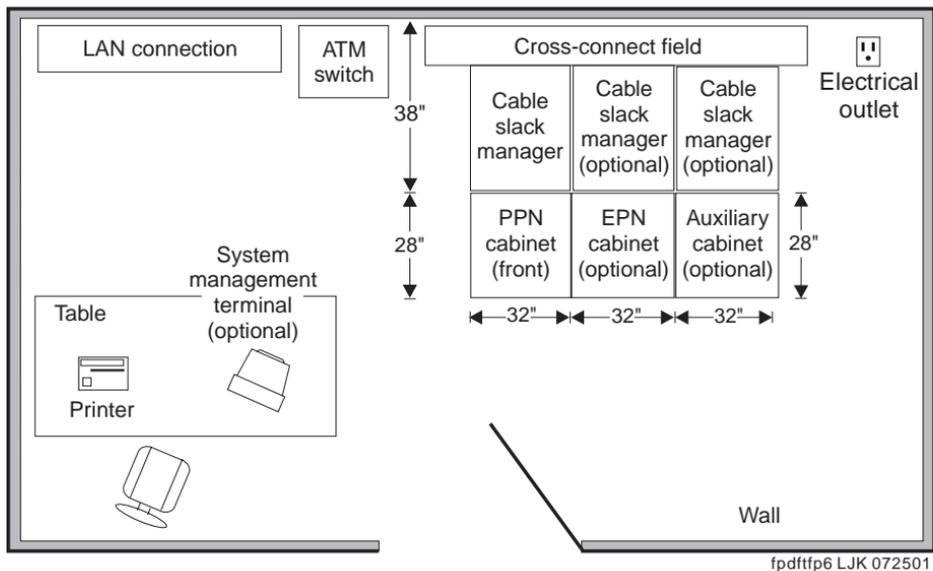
Typical Floor Plan with ATM Switch (Not available with Category B)
